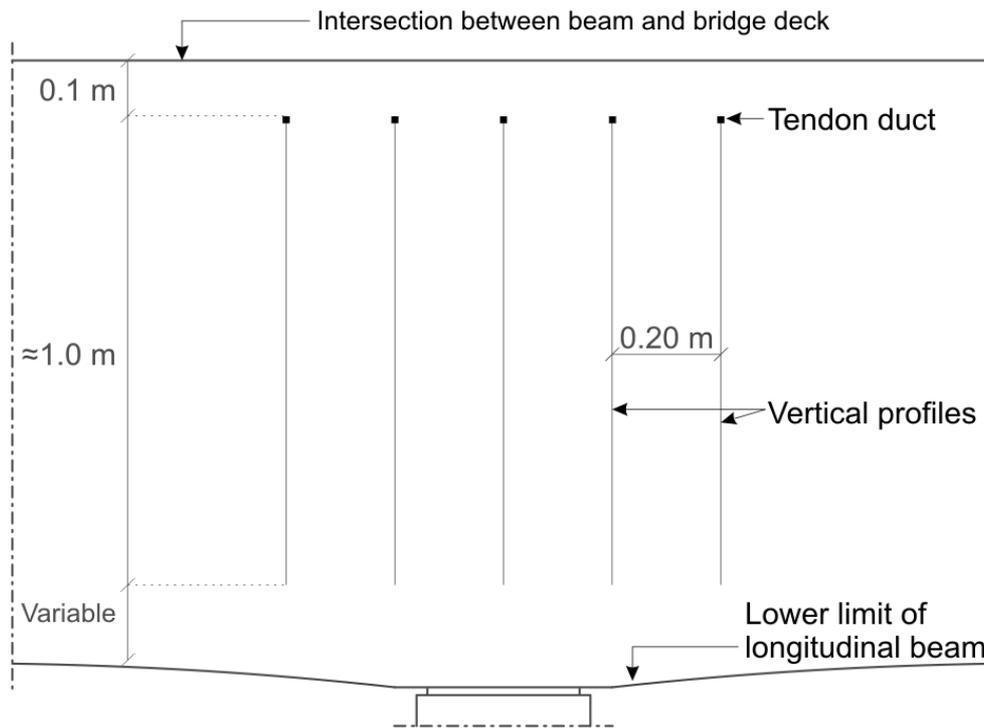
Location of the tendon duct in a position that corresponds to a cross-section over a support column.
